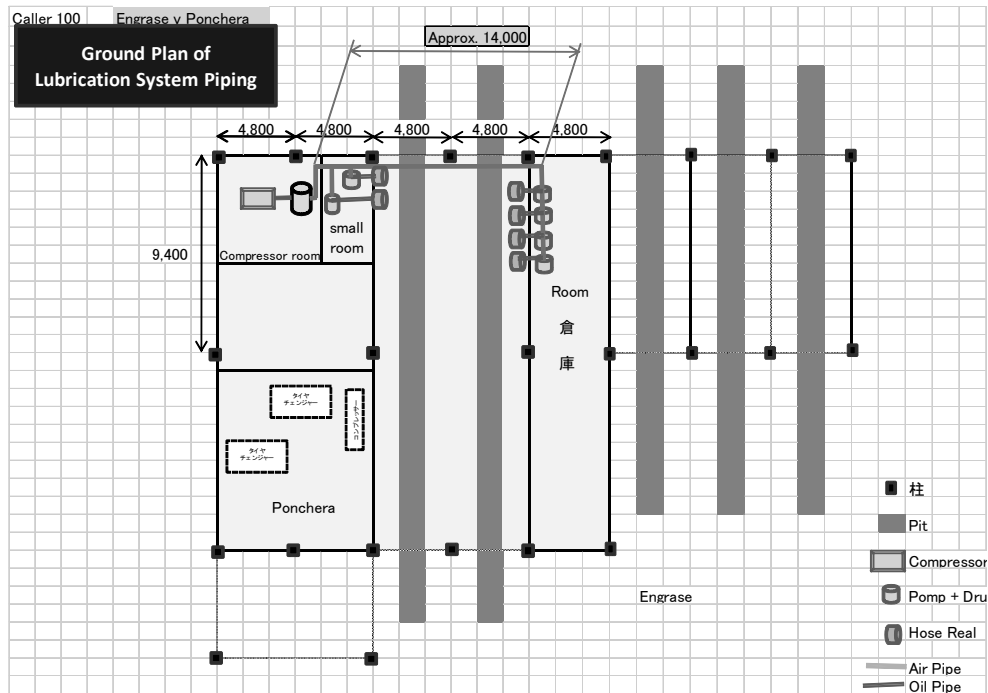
Ground Plan of the Lubrication System Piping (Unit: mm)
